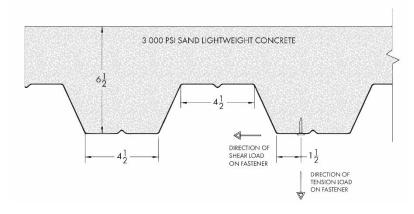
A—FASTENER INSTALLATION IN 3-INCH-DEEP STEEL DECK
